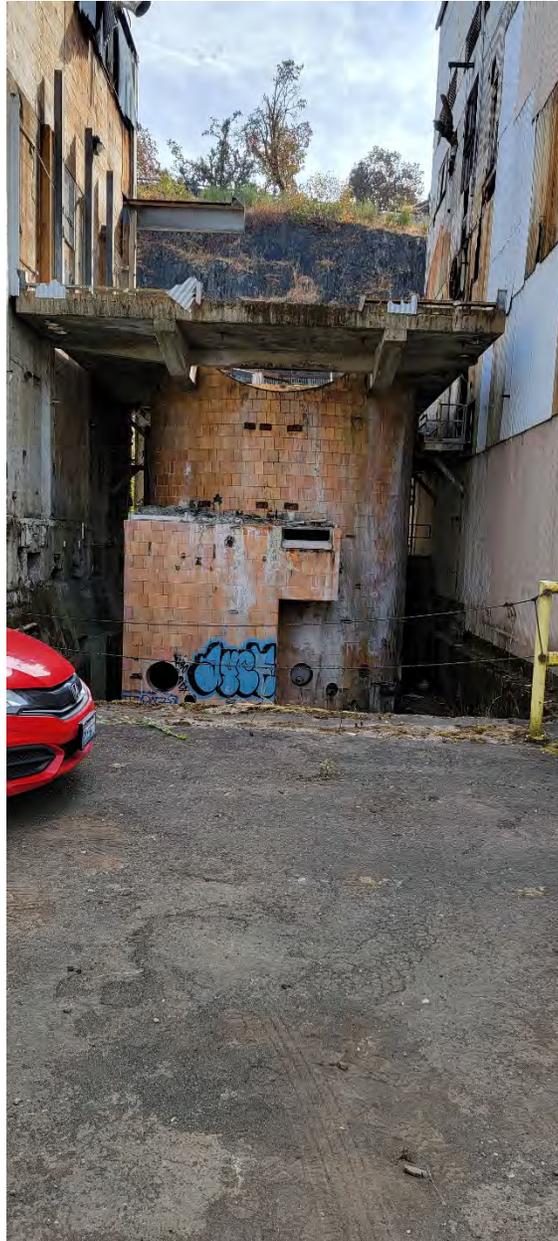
Building 41 – large brick tank (ID 41-A-220921-1)
